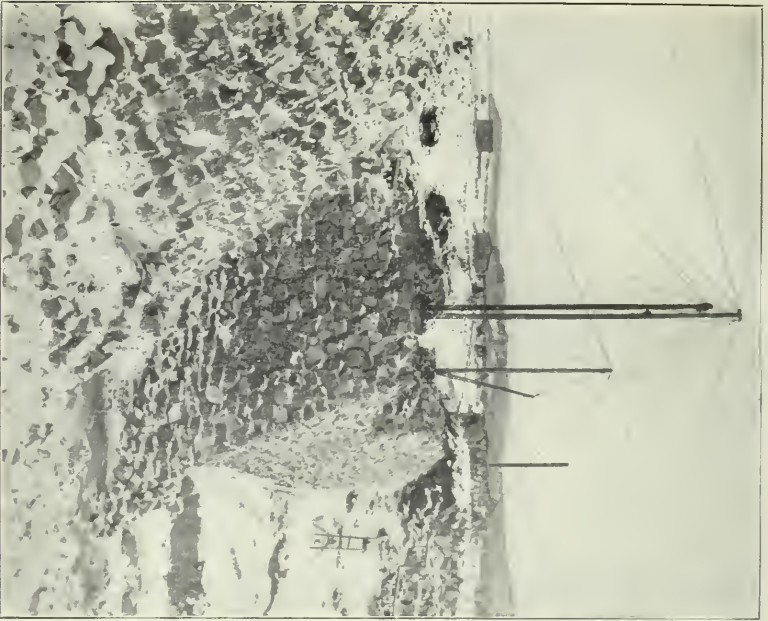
ZUNI DAM, LOOKING NORTH ALONG UP-STREAM FACE OF ROCK-FILL, AGAINST WHICH THE HYDRAULIC-FILL IS TO BE BUILT.
